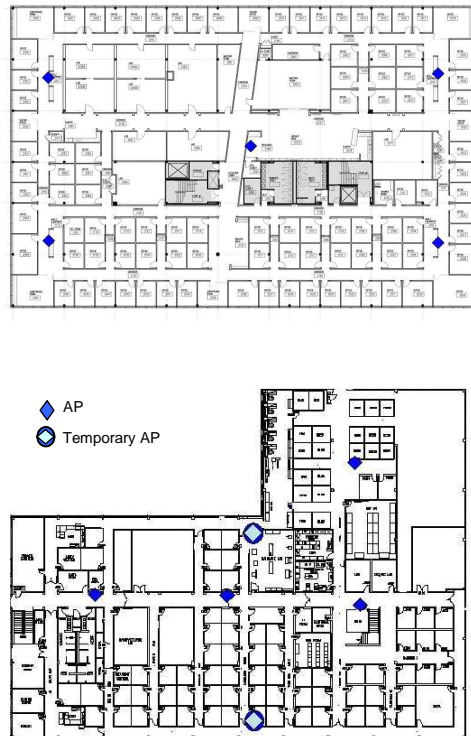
Floor plans for the BR and CA sites showing the access points (APs).
